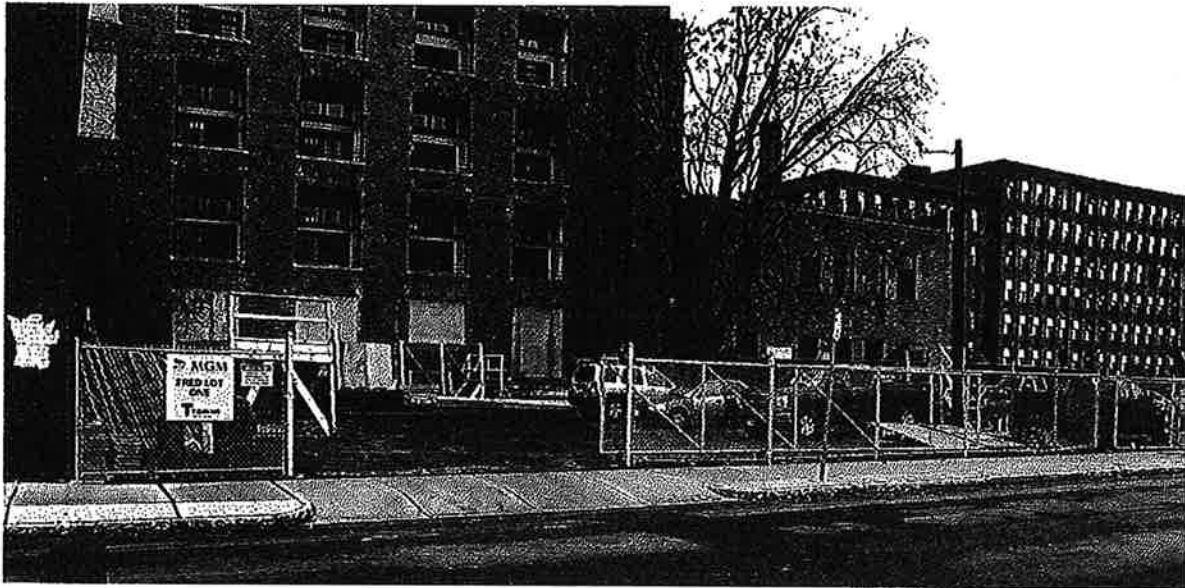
MGM 145 Union Parking Lot for construction workers' parking.
